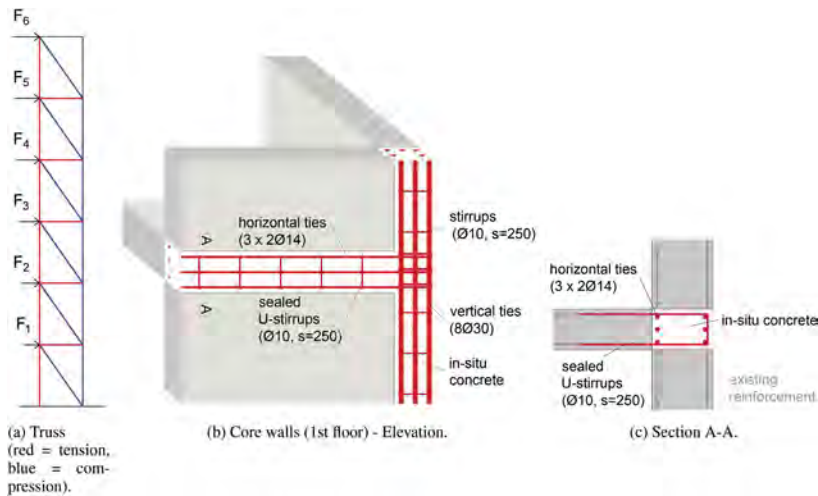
Design of new bracing system with reclaimed concrete walls to resist lateral forces.
